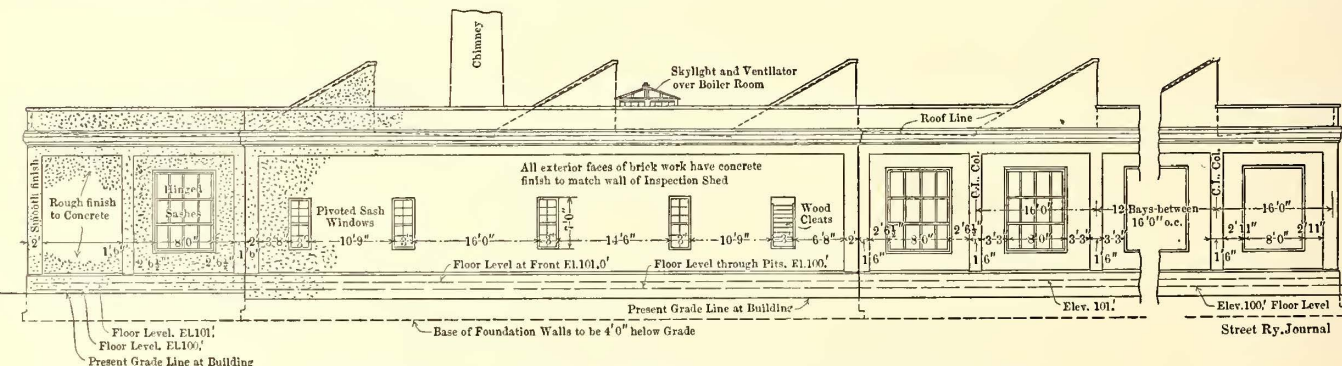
SIDE ELEVATION, LOOKING TOWARD THE BOILER HOUSE
